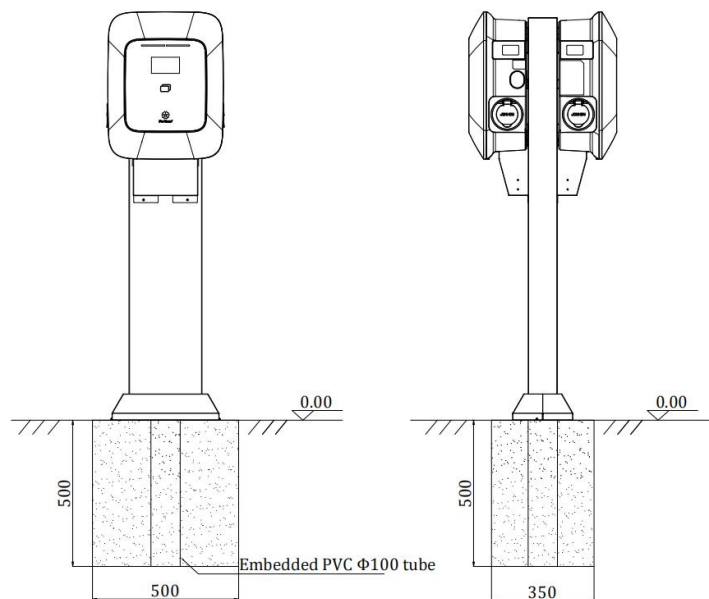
Front view and left view of the concrete foundation (Pole B)
